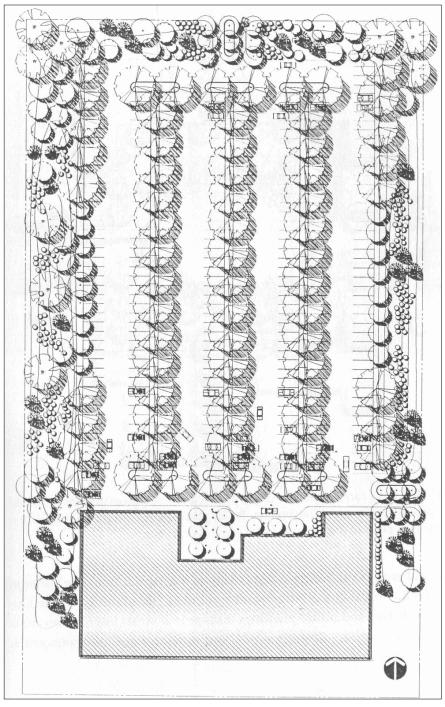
Trees in the parking lots are arranged in north-south rows to provide maximum shade on pavement during summer.
